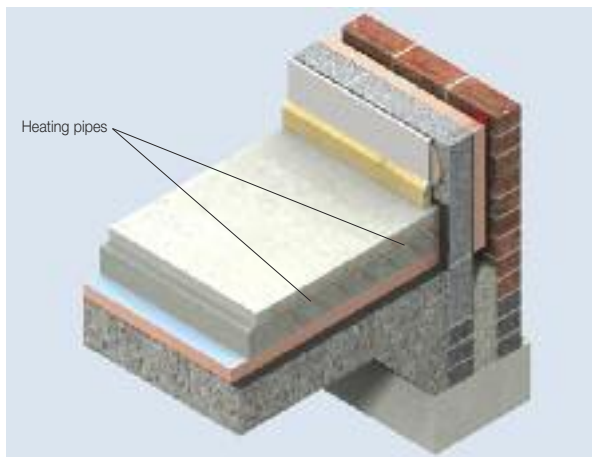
24 Hour Heating Application – Below the Floor Slab
